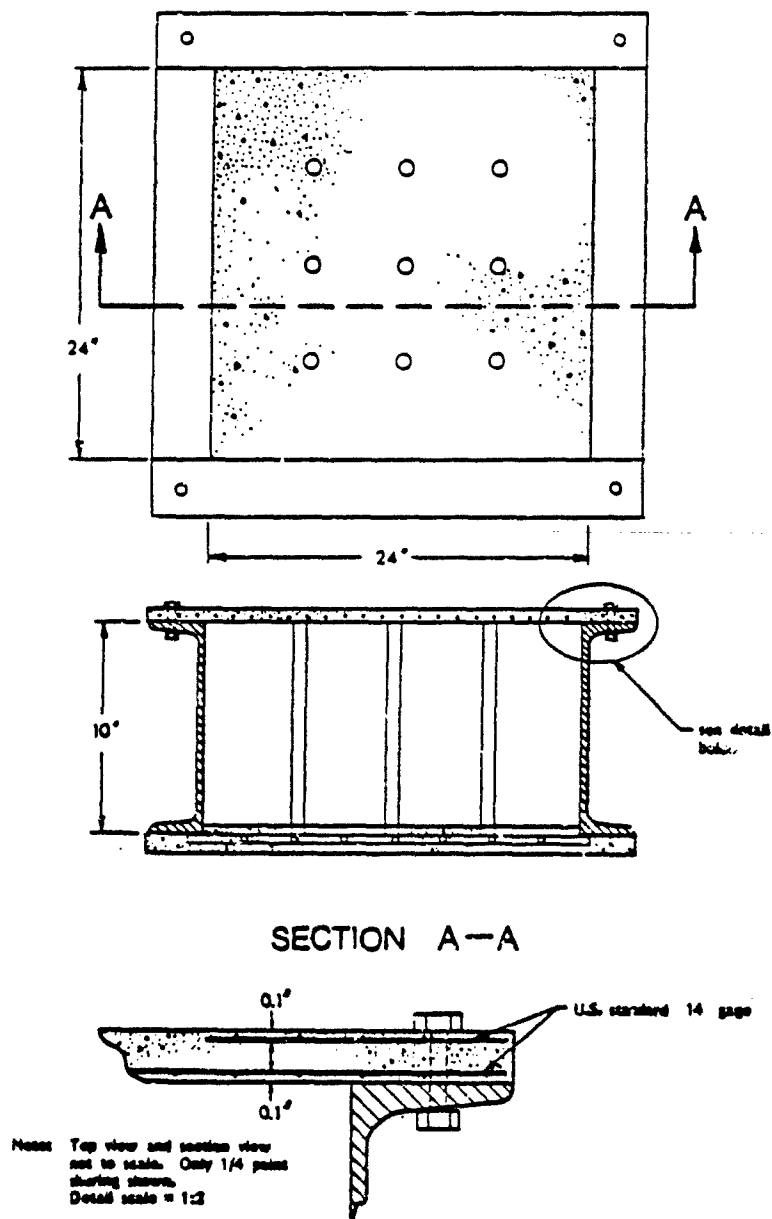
Model Shelter Plans, Experiments 4180 and 4185.
